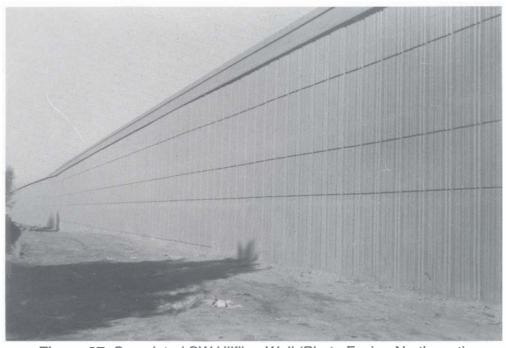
Completed SW Hilfiker Wall (Photo Facing Northwest).
